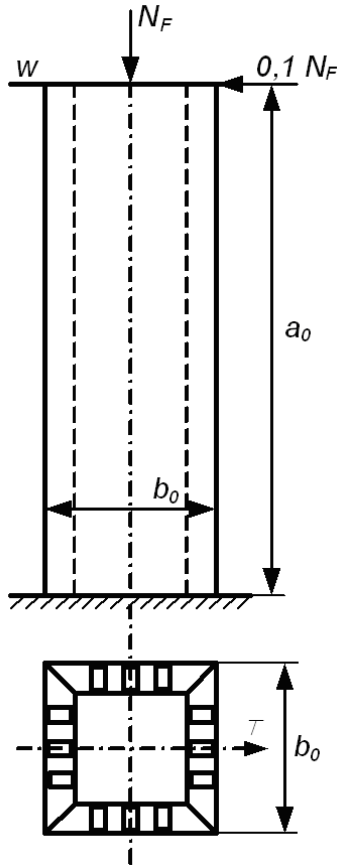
A cantilever column of square box cross section. The walls are constructed from cellular plates with RHS stiffeners
